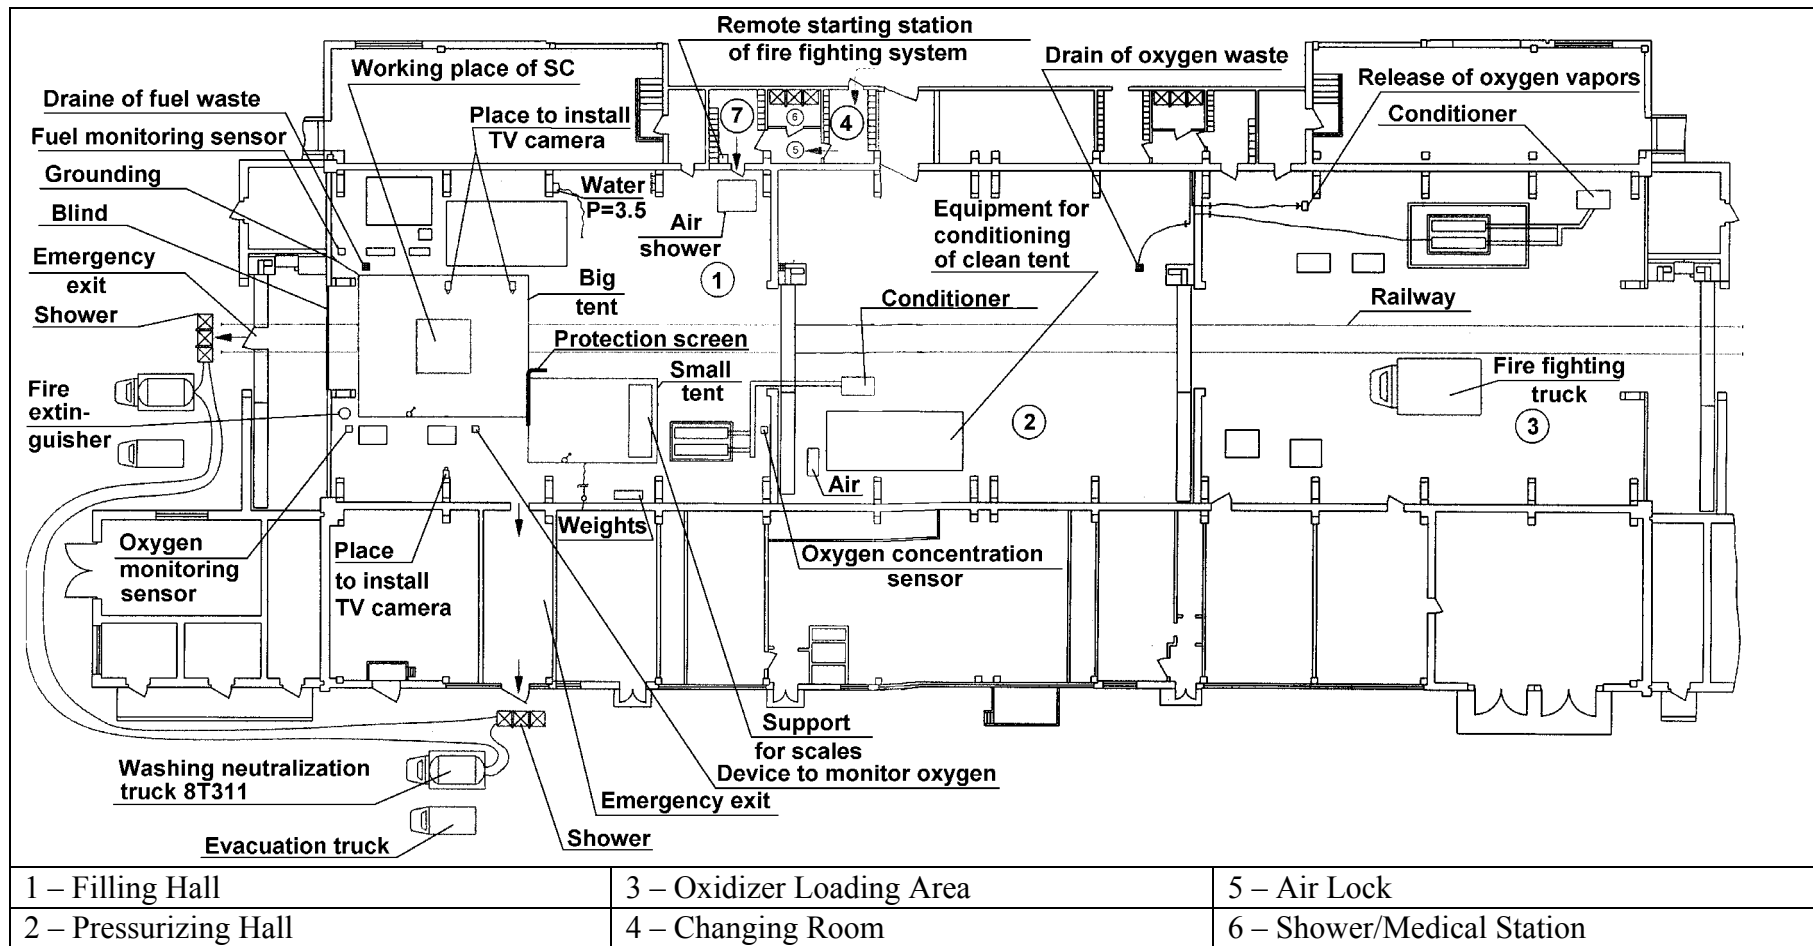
Hazardous Processing Facility, Building 44, at Site 31
